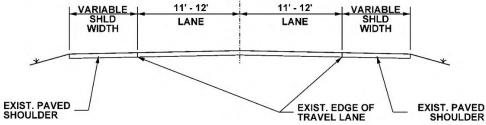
Alpine Segment - SH 12 Typical Section Location Near MP 32
